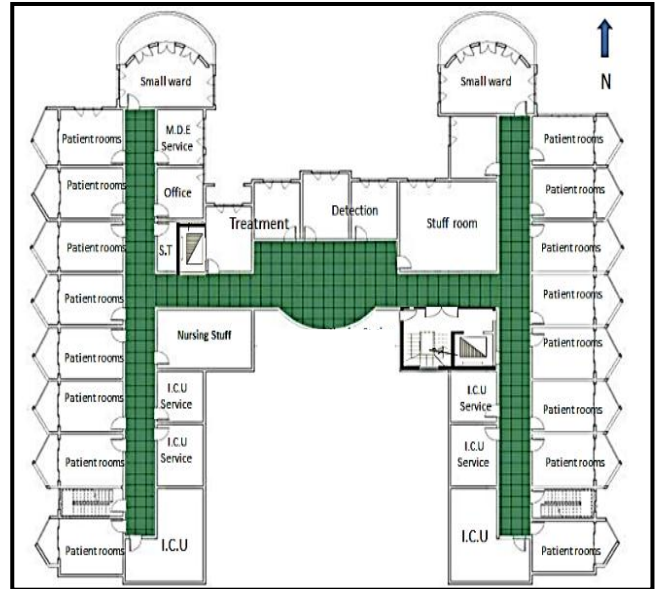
Proposed plan of a hospital regarding energy and economic issues
